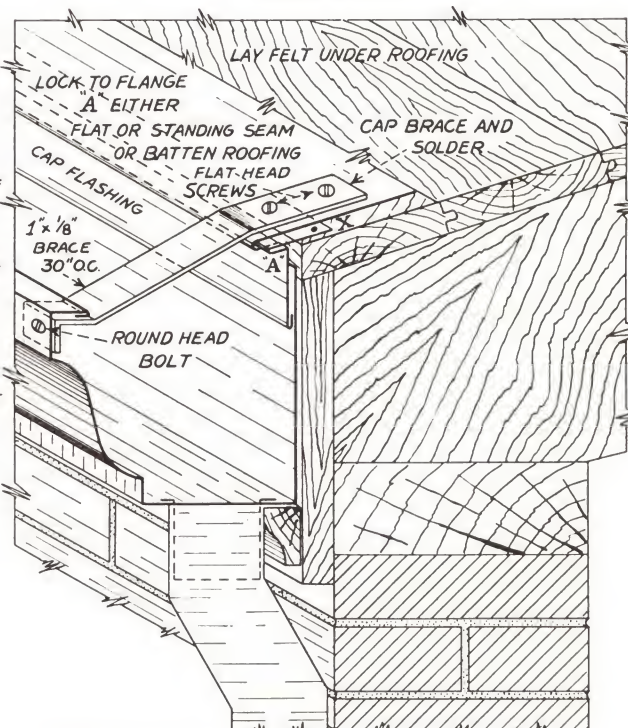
HANGING GUTTER WITH CAP FLASHING, FOR FLAT SEAM, STANDING SEAM AND BATTEN ROOF INSTALLATION SCALE 2"=1'-0"
